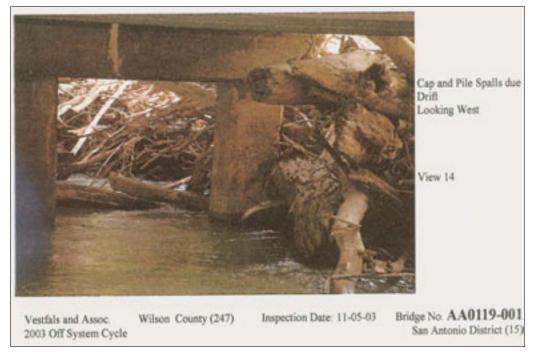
Photo shows debris build up and spalls looking West on the Wilson County CR 117 Bridge.
